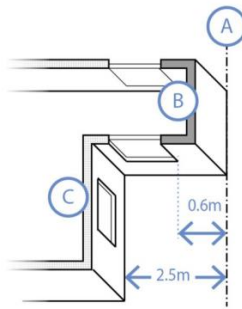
Fire separation and windows: boundary (A), 2-hrs fire wall (B), not fire rated wall (C)
